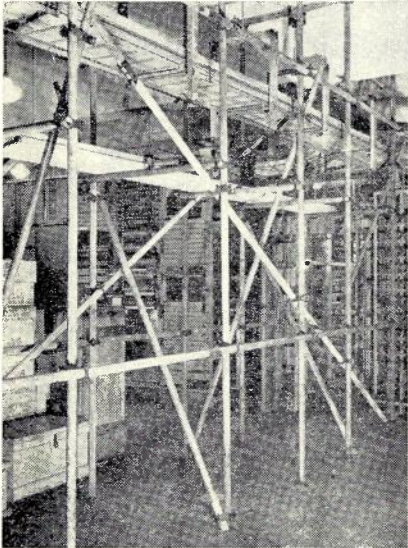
Tubular scaffolding and catwalk erected around the runway to be lifted.
